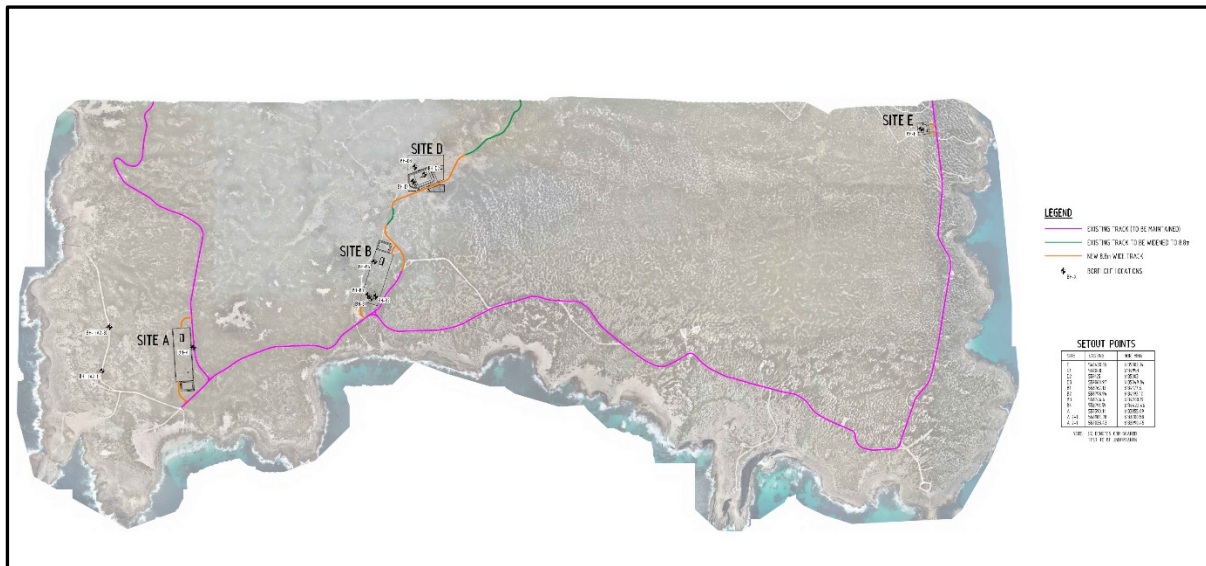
Launch Complex – Planned facility locations (A, B, D and E)
